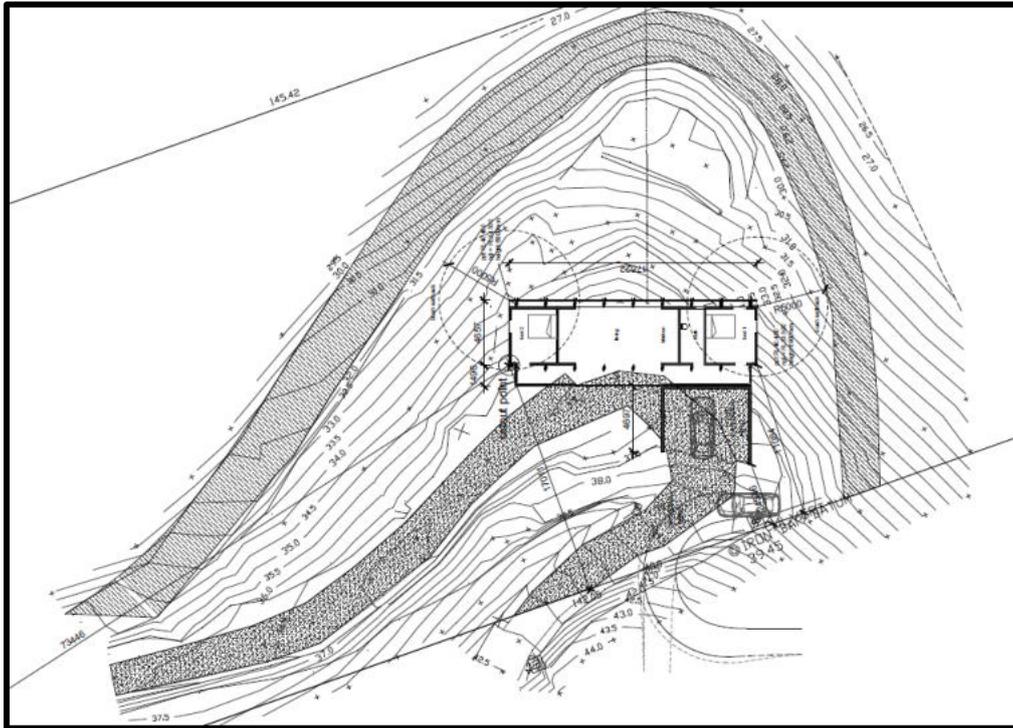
Indicative/conceptual dwelling design for Lot 1.
